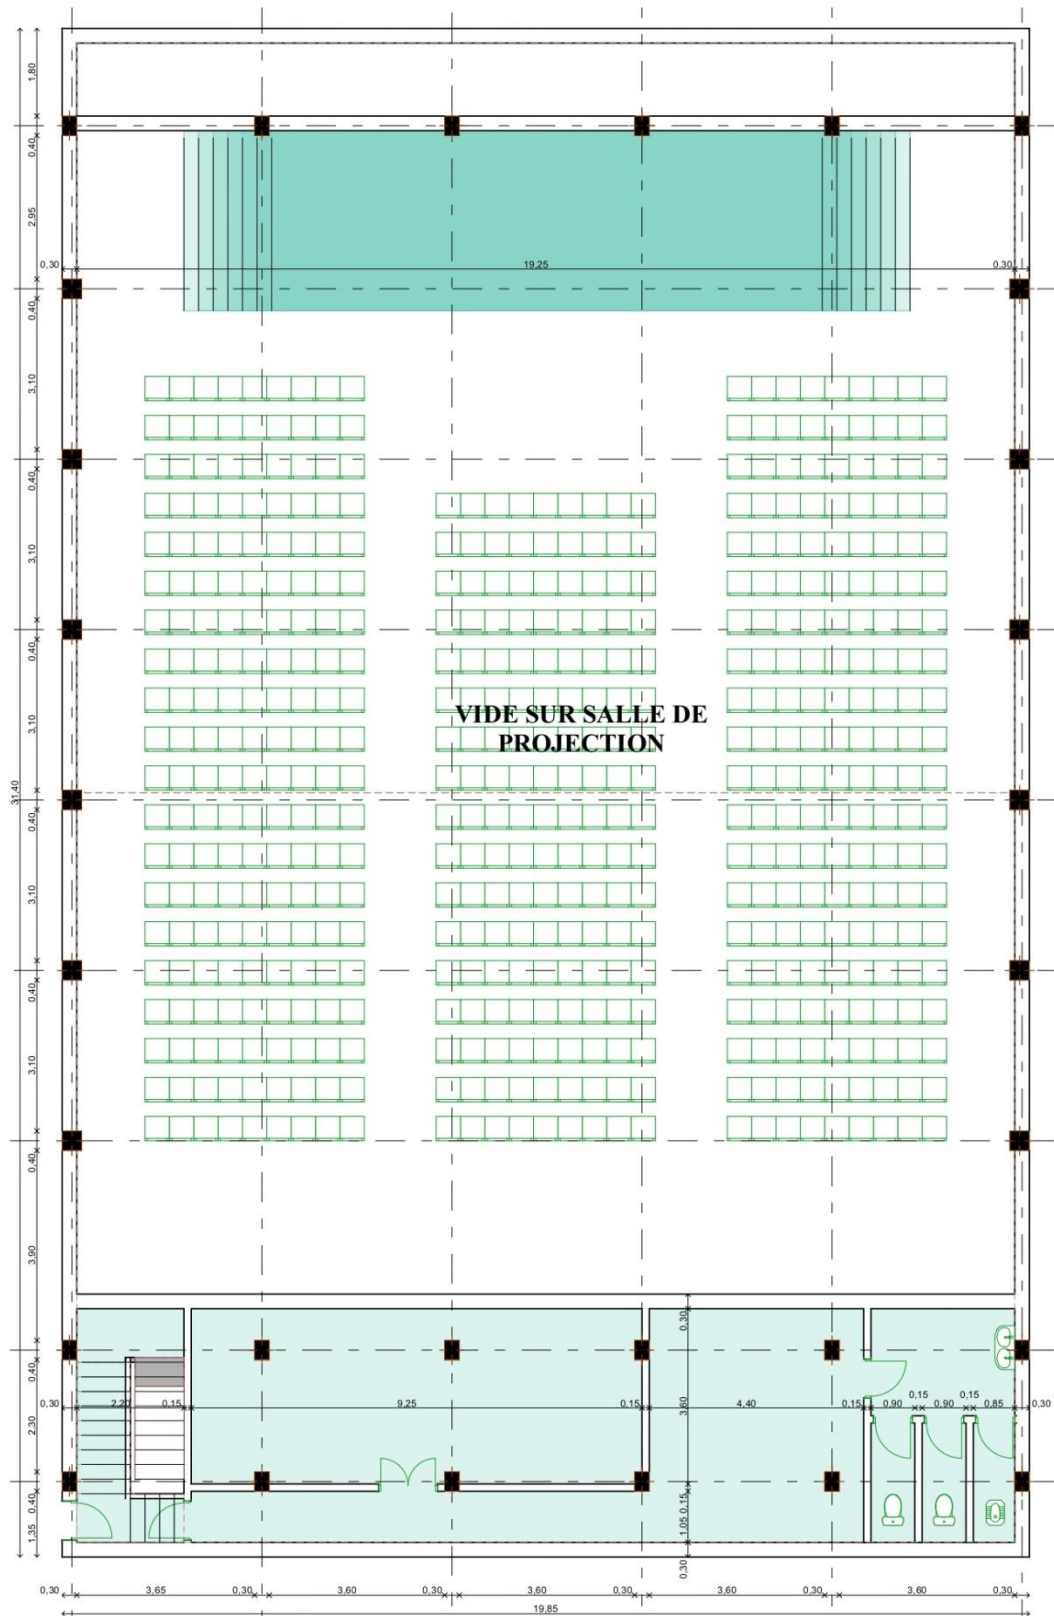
NEBVLA Architectural Renovation Plan (Appendix 10)
